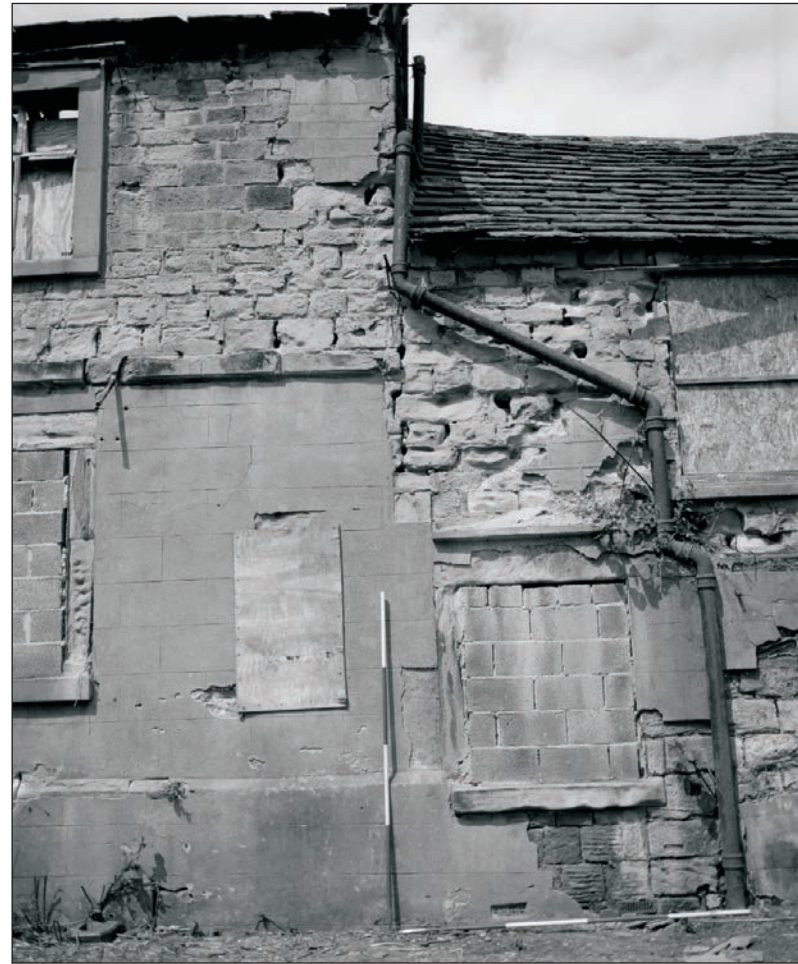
View of vertical joint between Building 2 and 3, south elevation (Film 10.06)
